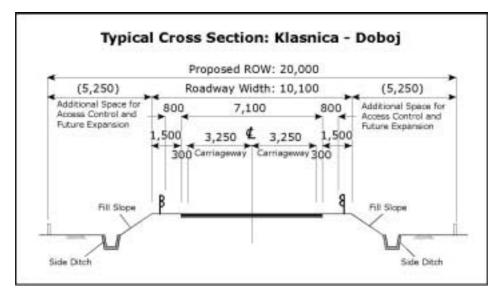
Typical Cross Section for Klasnica - Doboj Improvement
